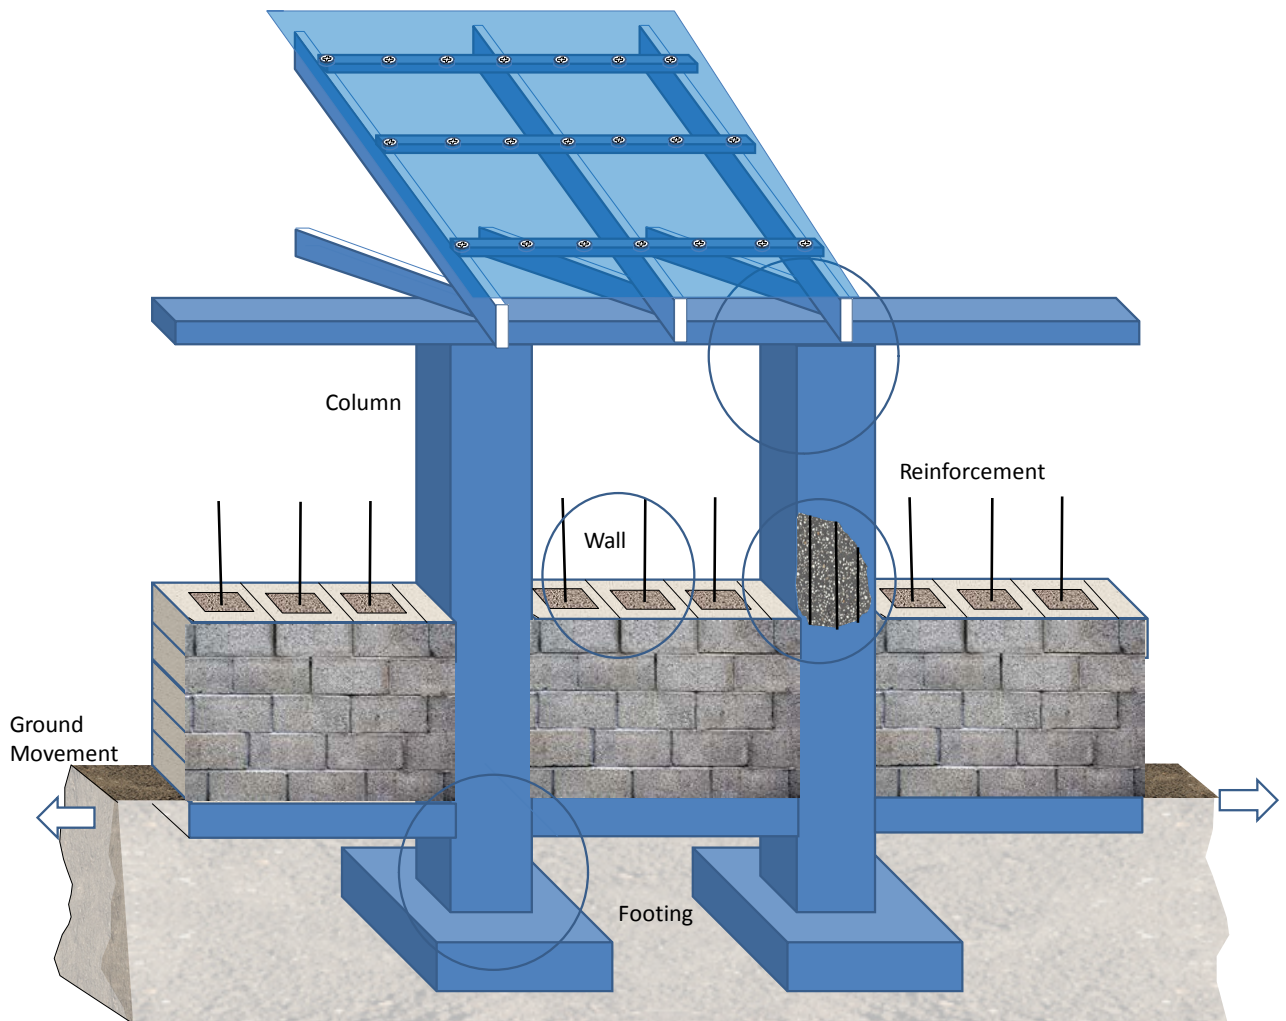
Critical connection areas in designing building structures to resist seismic loads.
